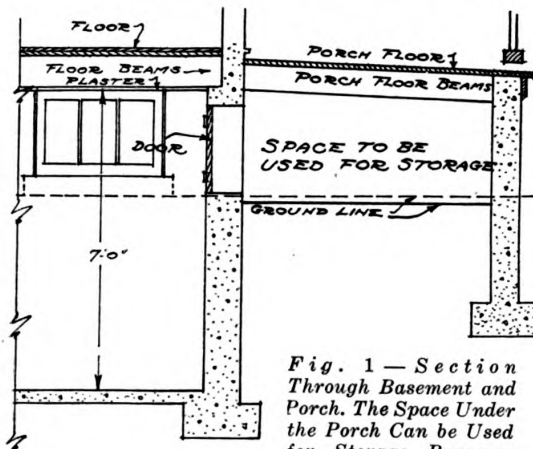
Section Through Basement and Porch. The Space Under the Porch Can be Used for Storage Purposes
